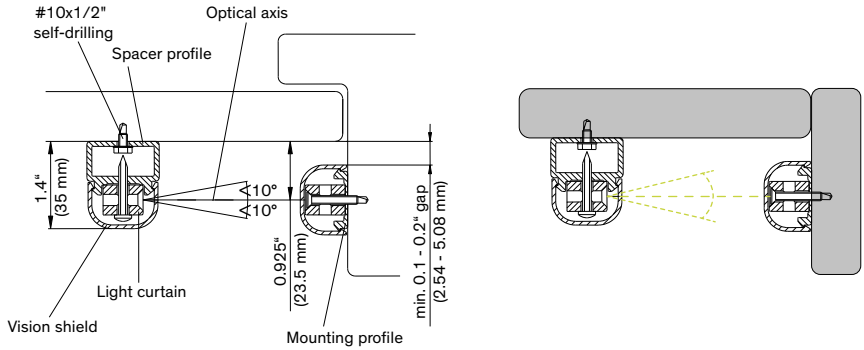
Mounting details of side opening doors with spacer and mounting profile
